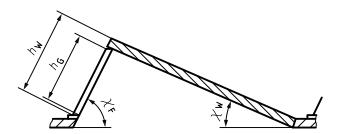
Dimensions used to describe the geometry of shed rooflights
